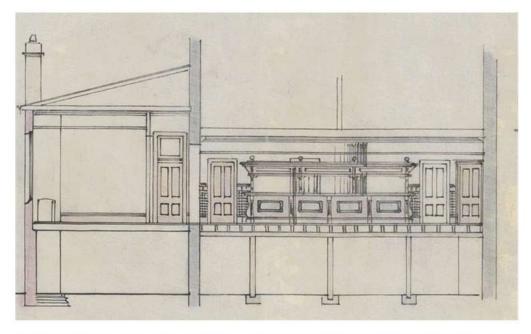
Detail of the 1911 plans showing the proposed new bar arrangements. The extant ground floor level ceiling reflects the corresponding bar arrangements in this space.
